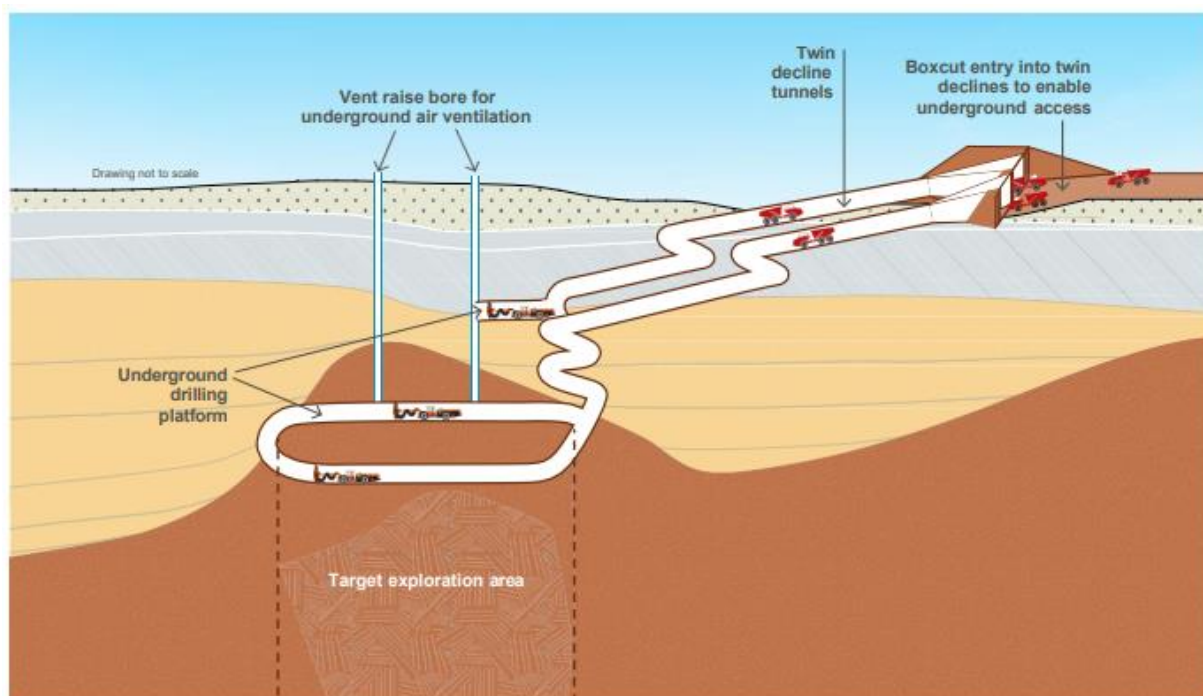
| Conceptual Plan of Oak Dam Underground Access.
